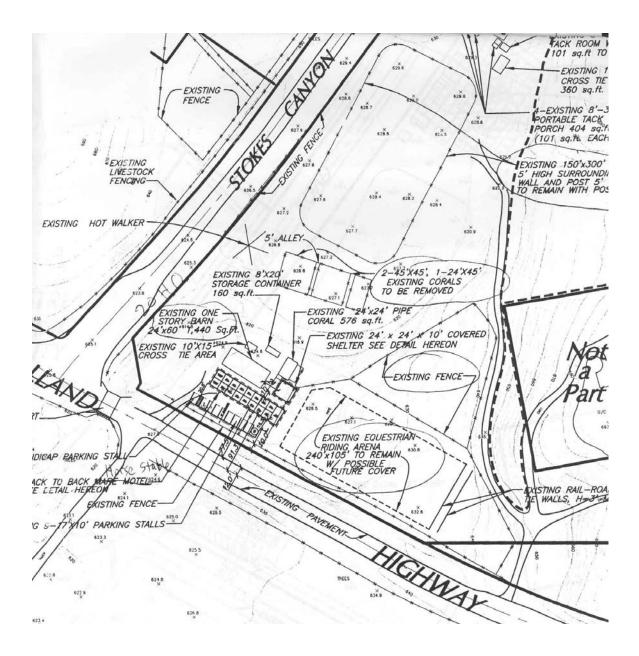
CDPA No. 4-02-131 Site Detail – South (Existing)
